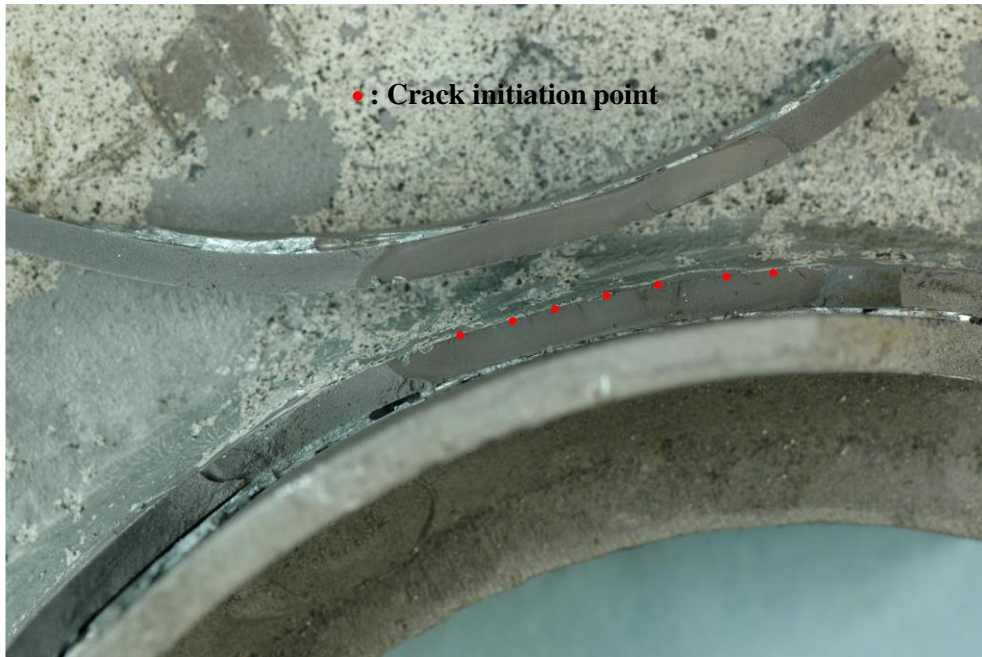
Fatigue fracture surface and identified crack initiation points in Type III-8 Arm
